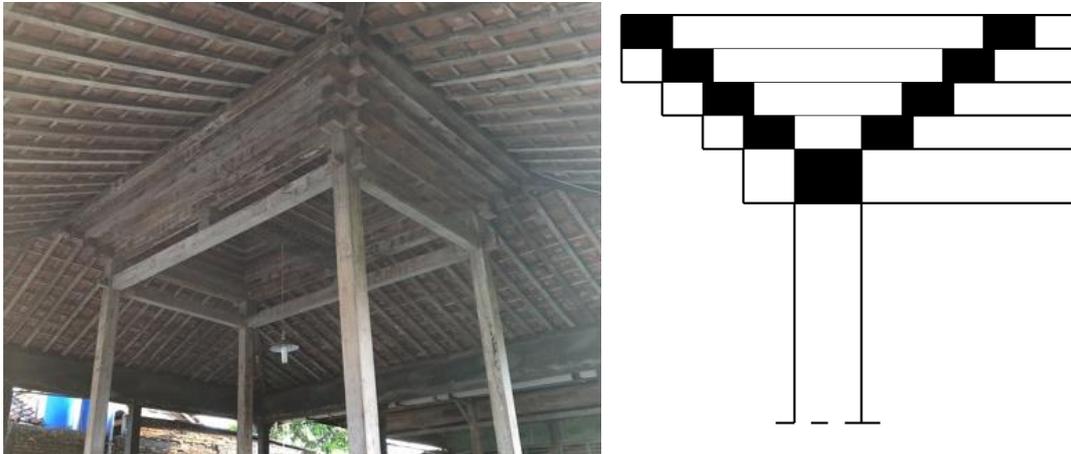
'Tumpang sari' and Tumpang sari section (right) (Johanita Anggia Rini, 2021; section modified from Saragih, 1987)
